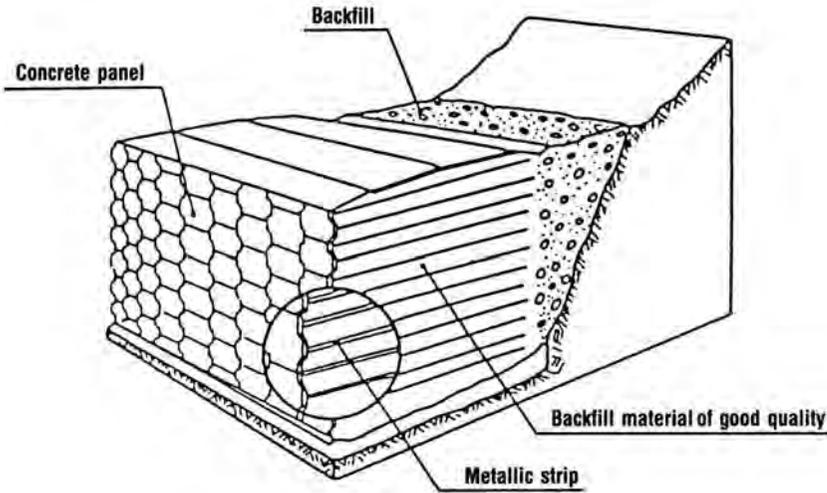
Retaining wall support using reinforced soil.⁵⁶
